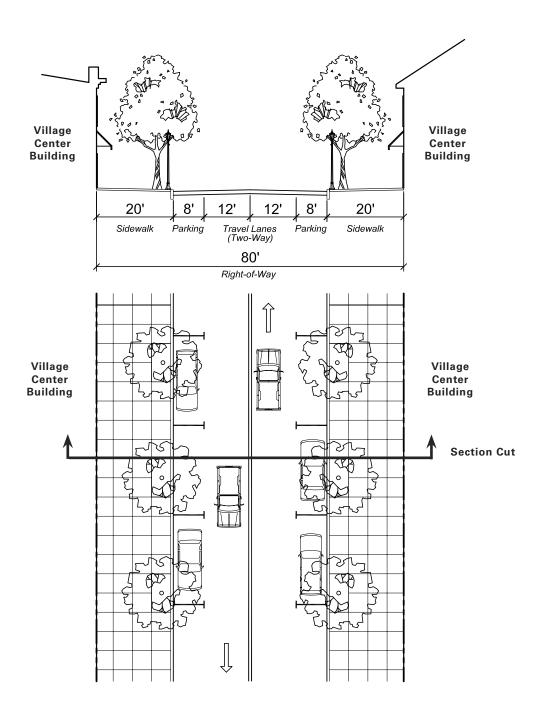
Proposed Section and Plan: Village Center Street A
